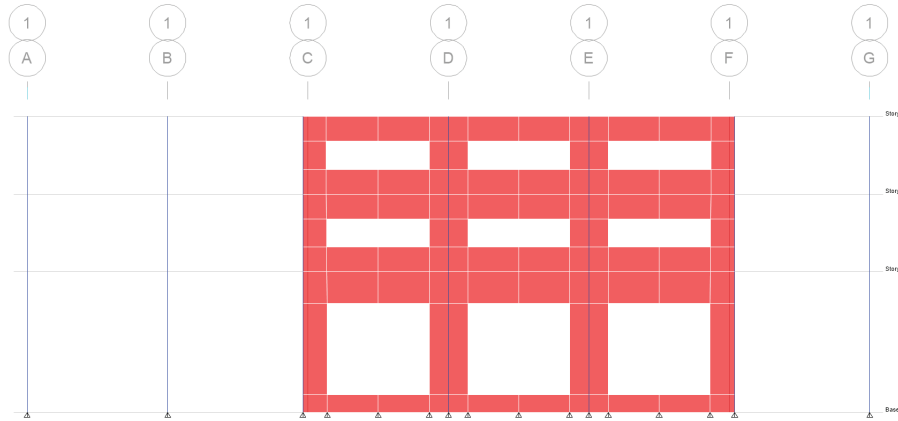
ETABS Model for Shear Wall Pattern No. 2.
